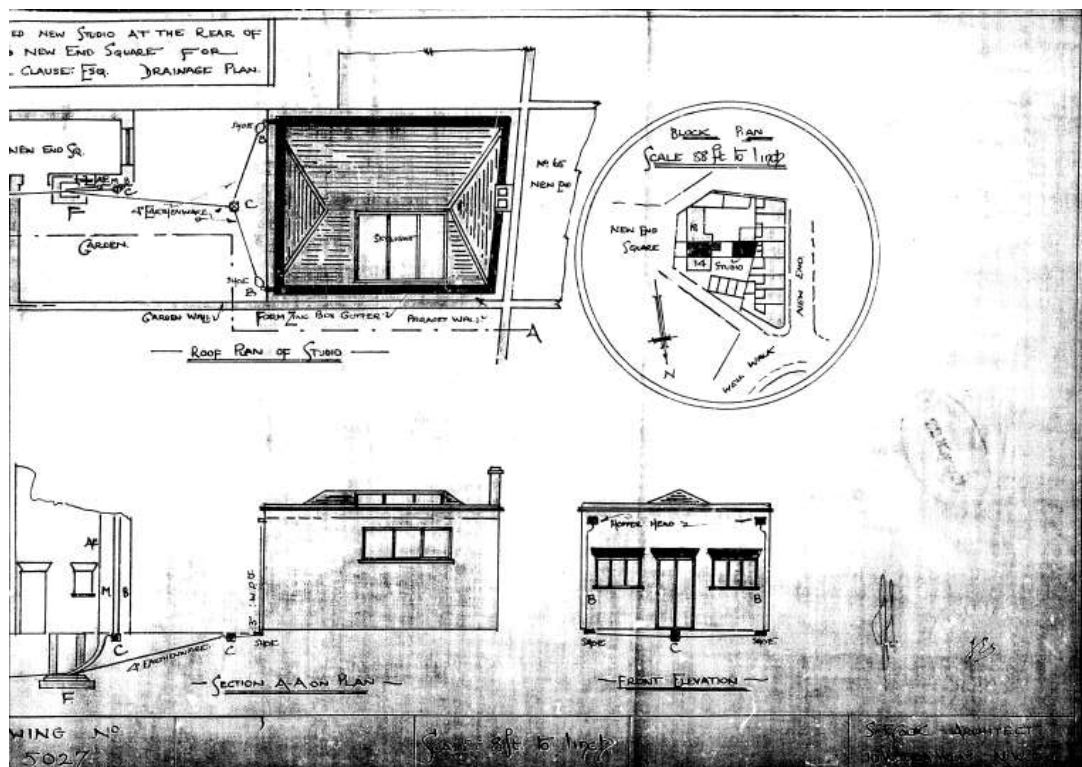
1927 Drainage plans showing proposed 'New studio at rear'
